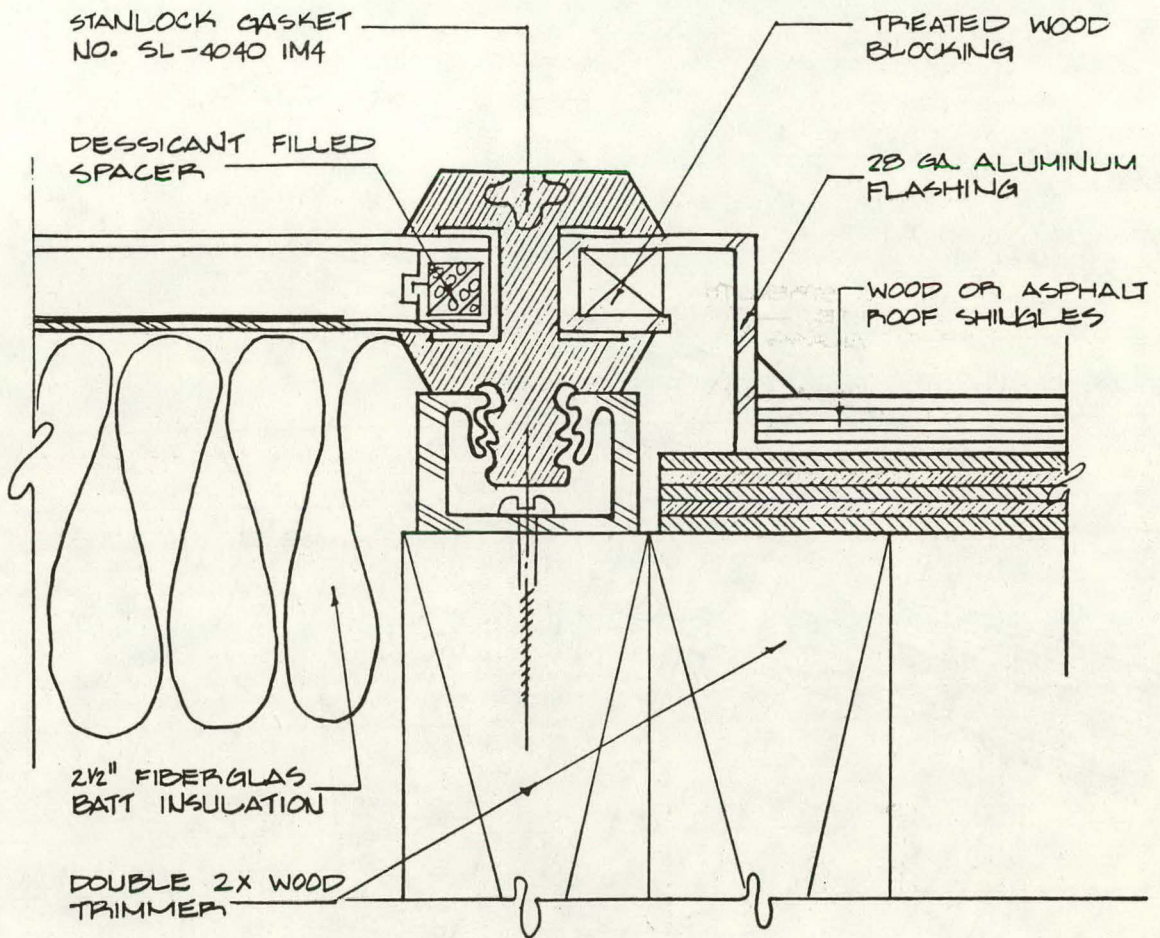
RPS proposed collector framing section at sloped roof intersection
